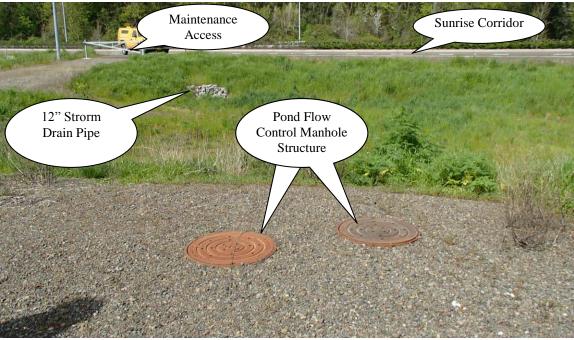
a view of bio-retention pond looking North toward Sunrise Corridor.
